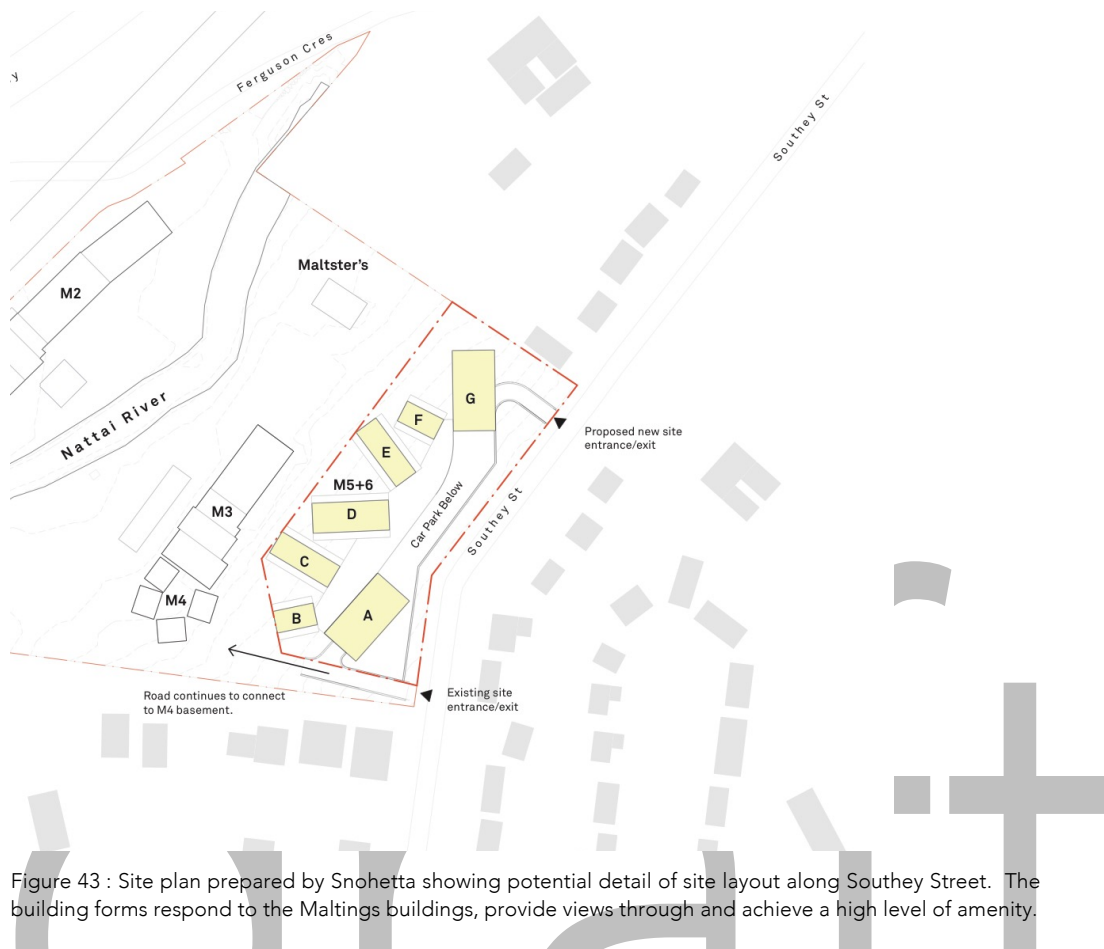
Site plan prepared by Snohetta showing potential detail of site layout along Southey Street. The building forms respond to the Maltings buildings, provide views through and achieve a high level of amenity.
